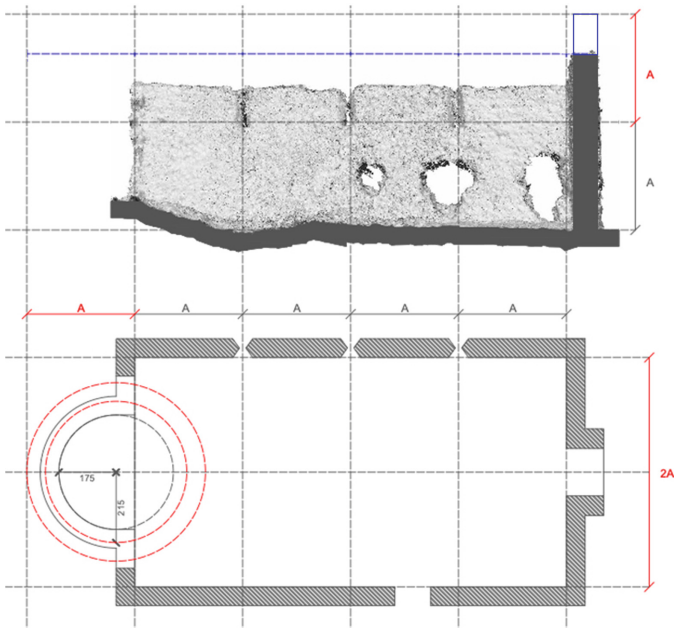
Reconstructions of the church of San Nicola in Myra hypothesis of the building modules (the bell tower and roof ridge in blue).
